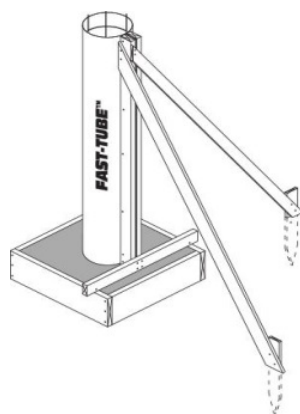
‘Frame-restraint’ method for casting in-situ walls (Umi Architectural Atelier)
